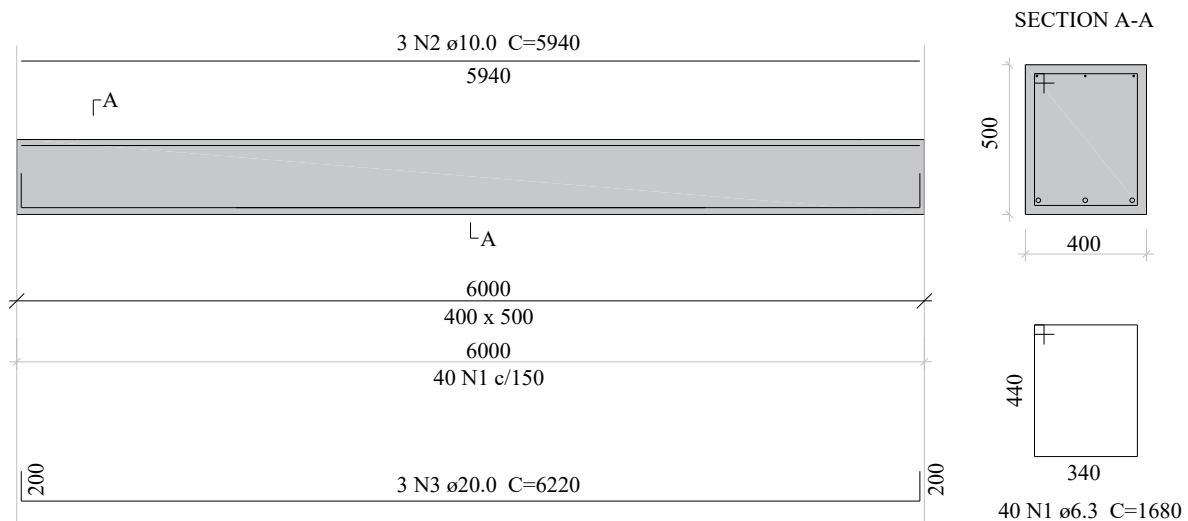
Dimensions (in mm) and steel reinforcement arrangement [8]
